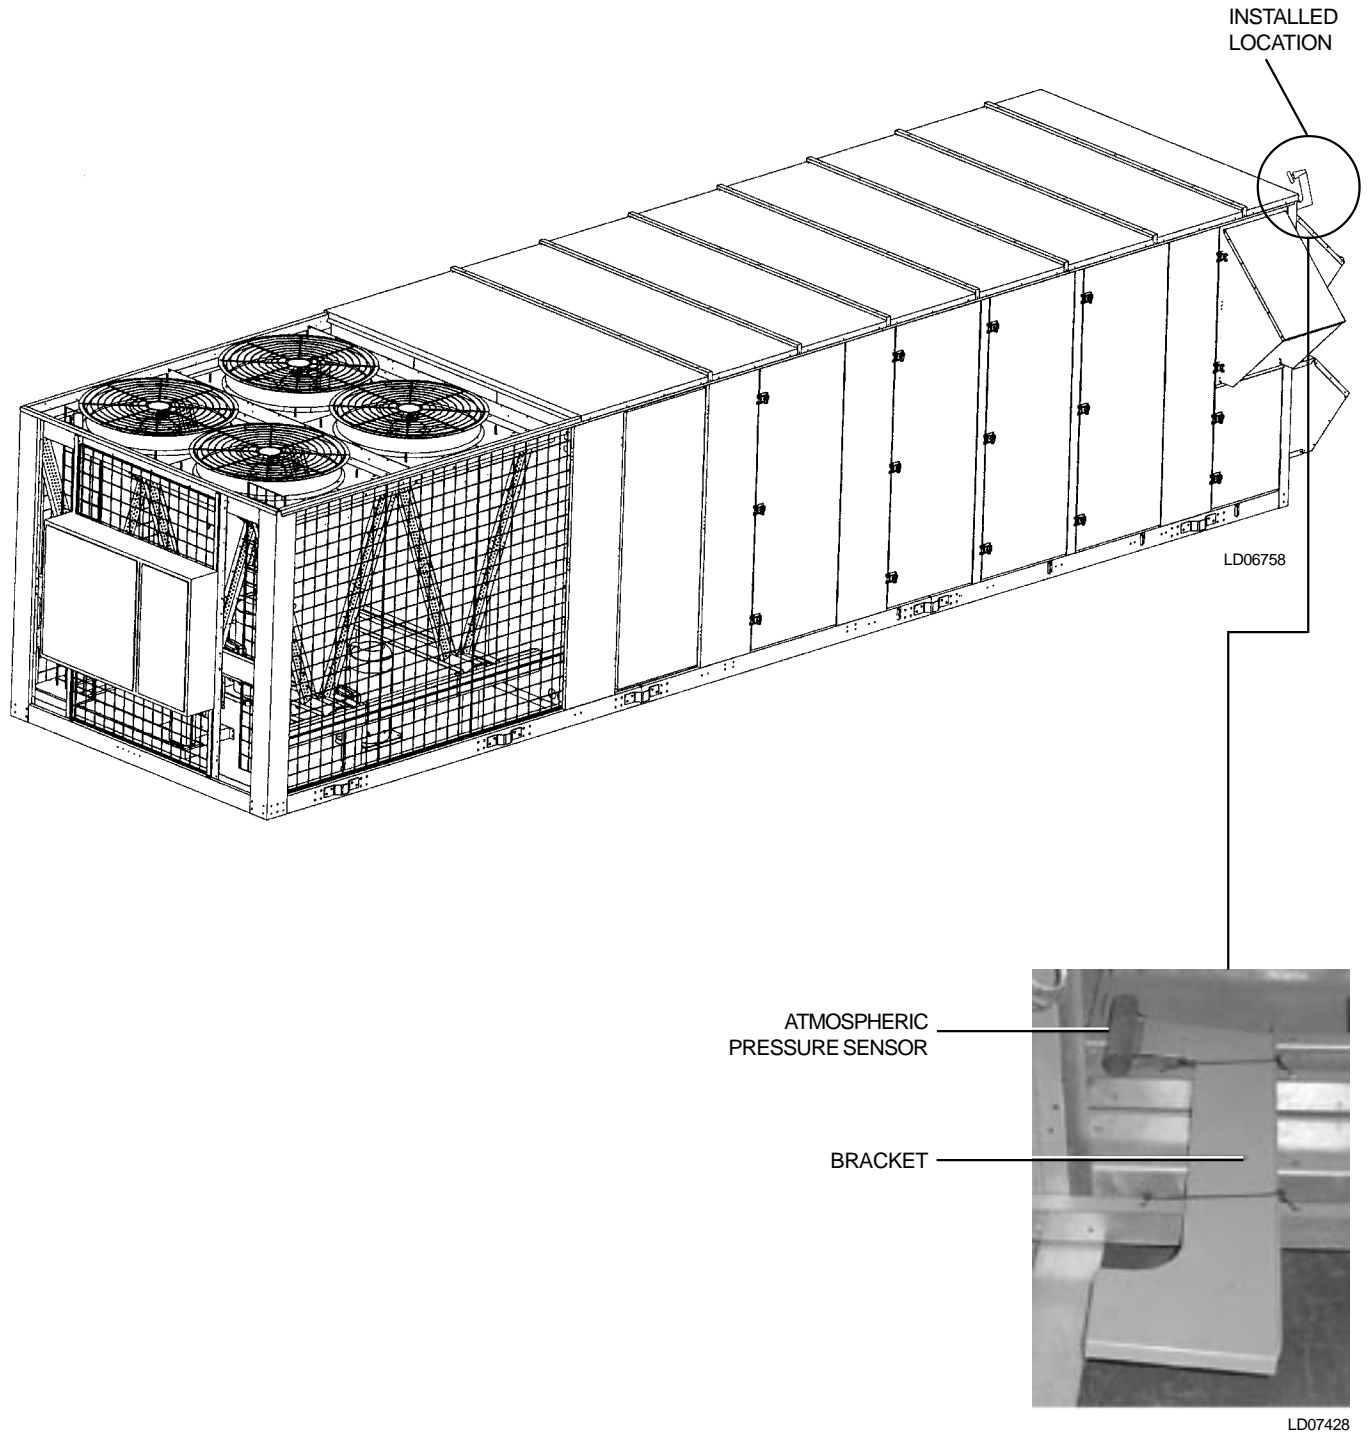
ATMOSPHERIC PRESSURE SENSOR AND BRACKET (SHIPPED IN SUPPLY FAN SECTION OF UNIT)
